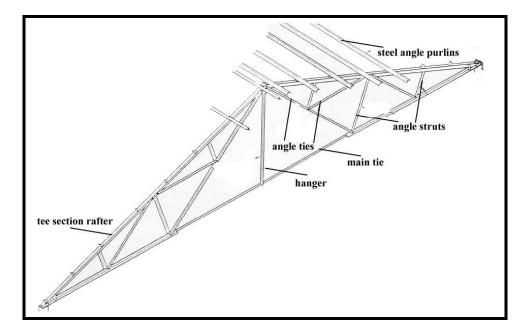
Steel trusses are composed of rafters, purlins, hangers, struts and ties (Foster, 1983:346).
